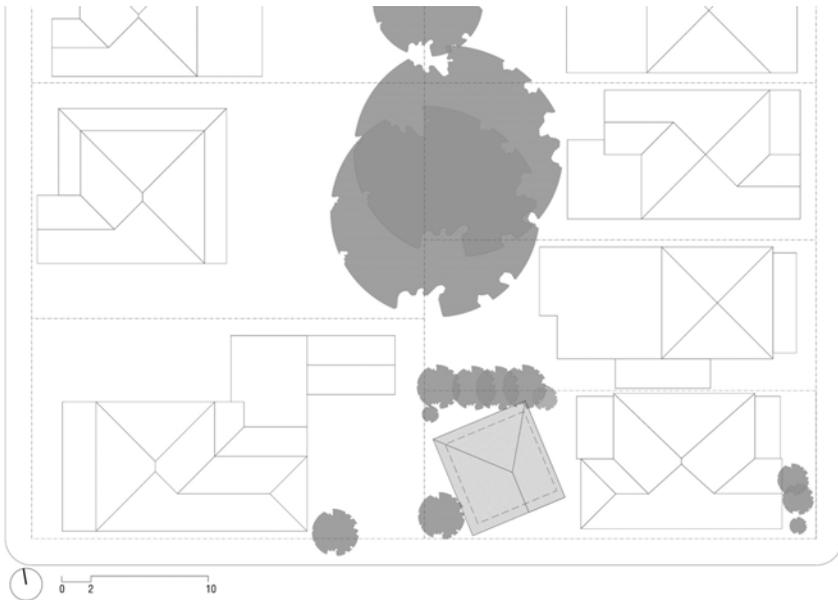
Phorm architecture + design with Silvia Micheli and Antony Moulis, One Room Tower (2016–18), West End Estate, Brisbane. Site plan.
